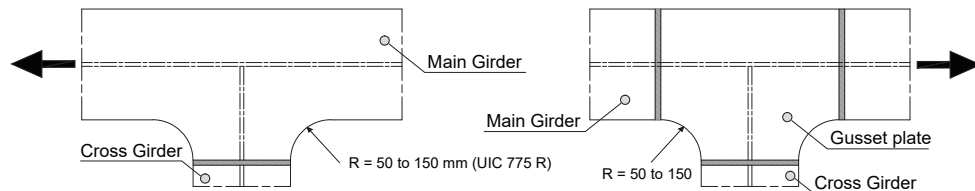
Details for connections between main and cross girders (UIC 775 R, 1984)
